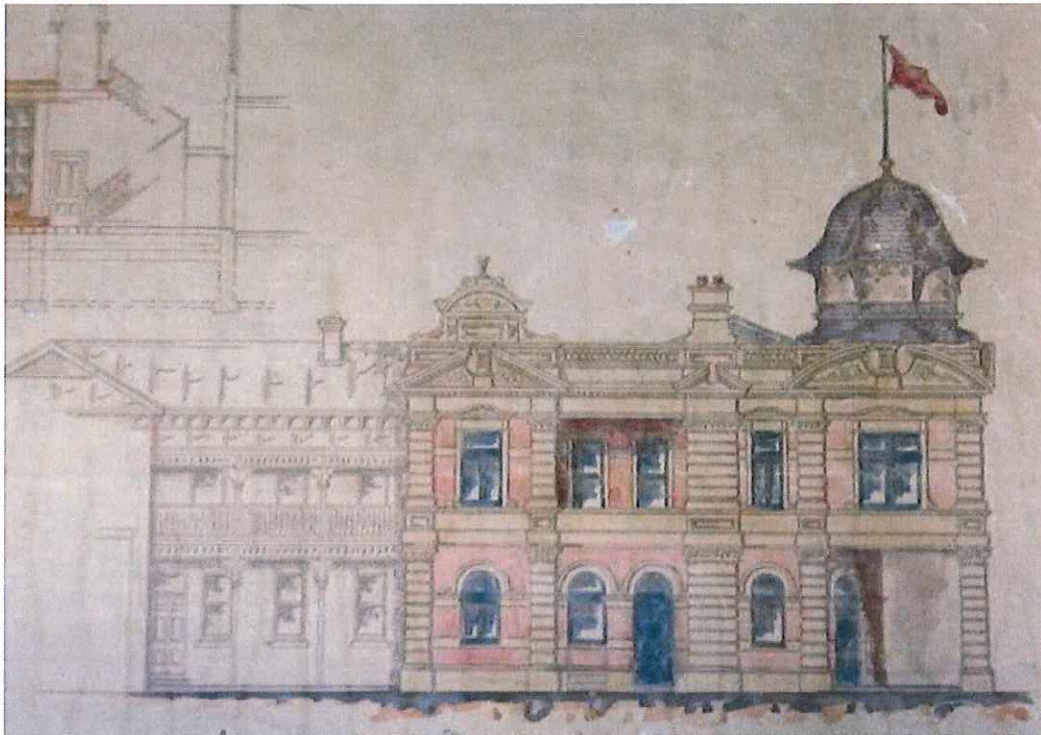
Elevations showing new façade to the Guildford Hotel – Johnson Street elevation c.1914 Source- State Library of Western Australia
